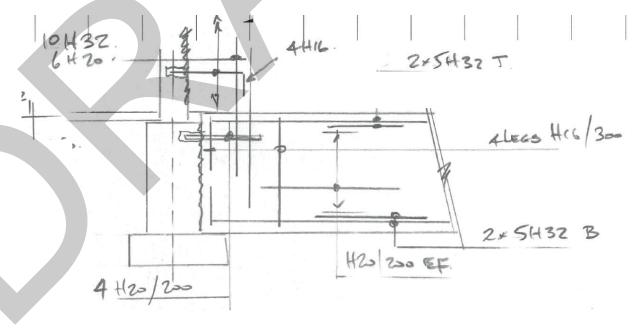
Concept column strengthening for external column (N.T.S.)
